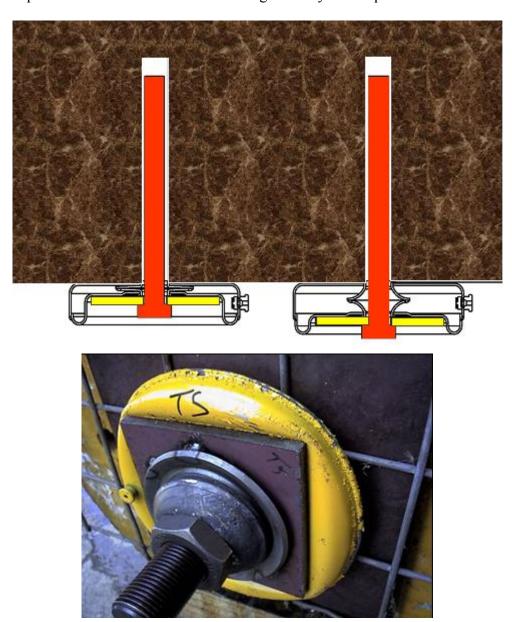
Water inflatable prestressing bladder used to pretension roof (cable) bolt.
